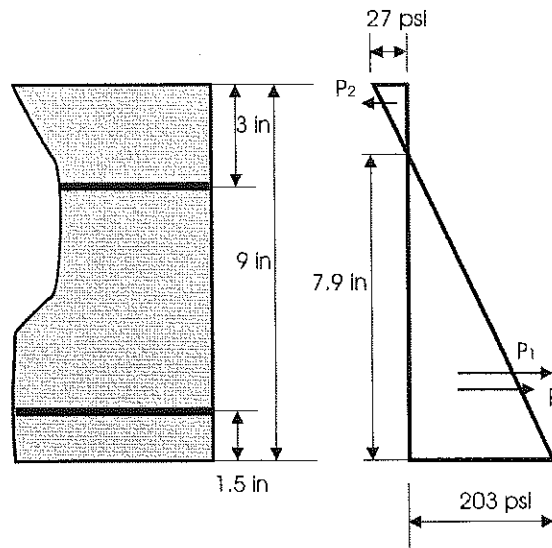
Total tensile stresses acting in the transverse direction of the deck (supported on prestressed concrete girders).
